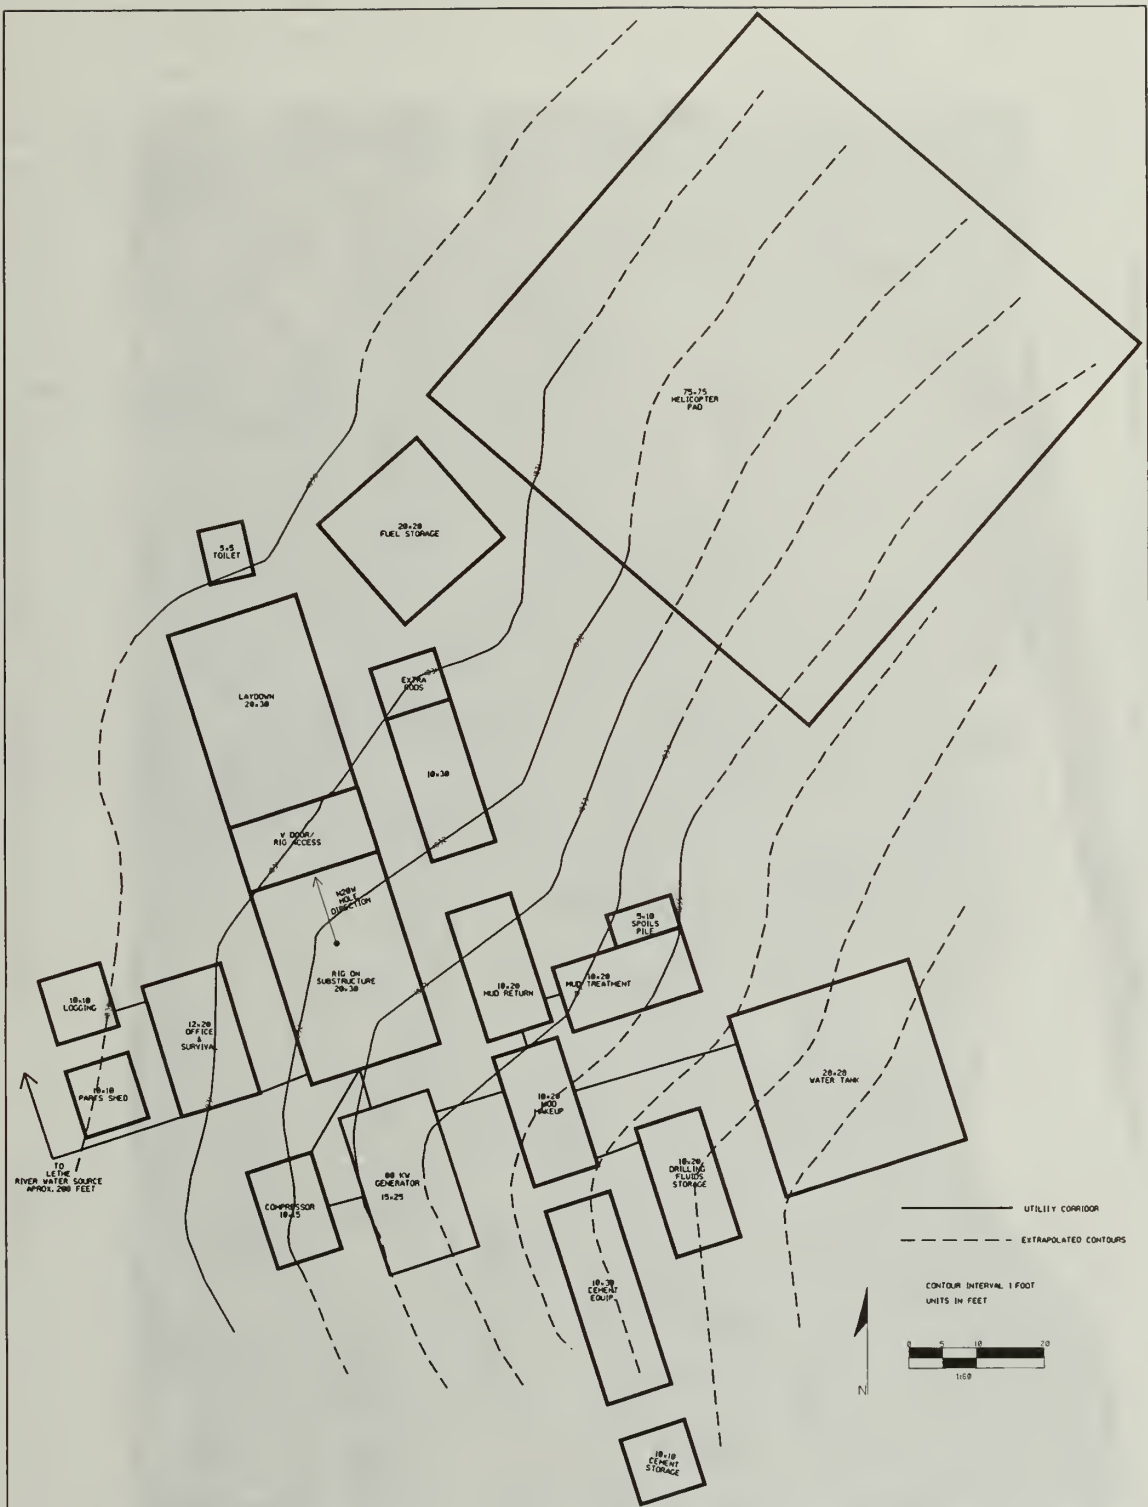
Proposed Layout of the Dome Drill Site and Supporting Field Camp
